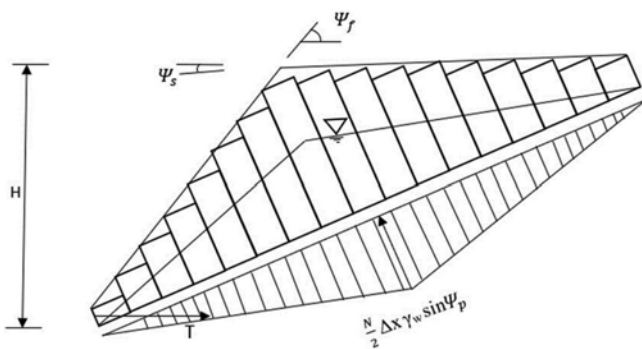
Rock Slope Subjected to Toppling Failure with Ground Water (Case 3)
